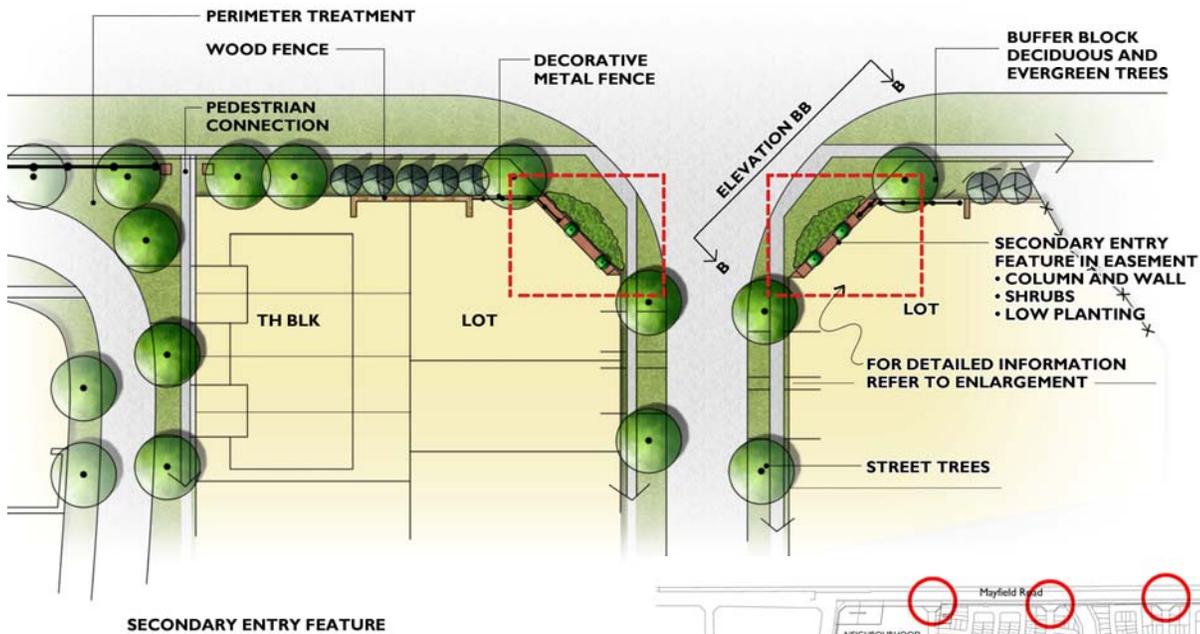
Secondary Gateway Layout, Example at Mayfield Road and Russell Creek Drive
